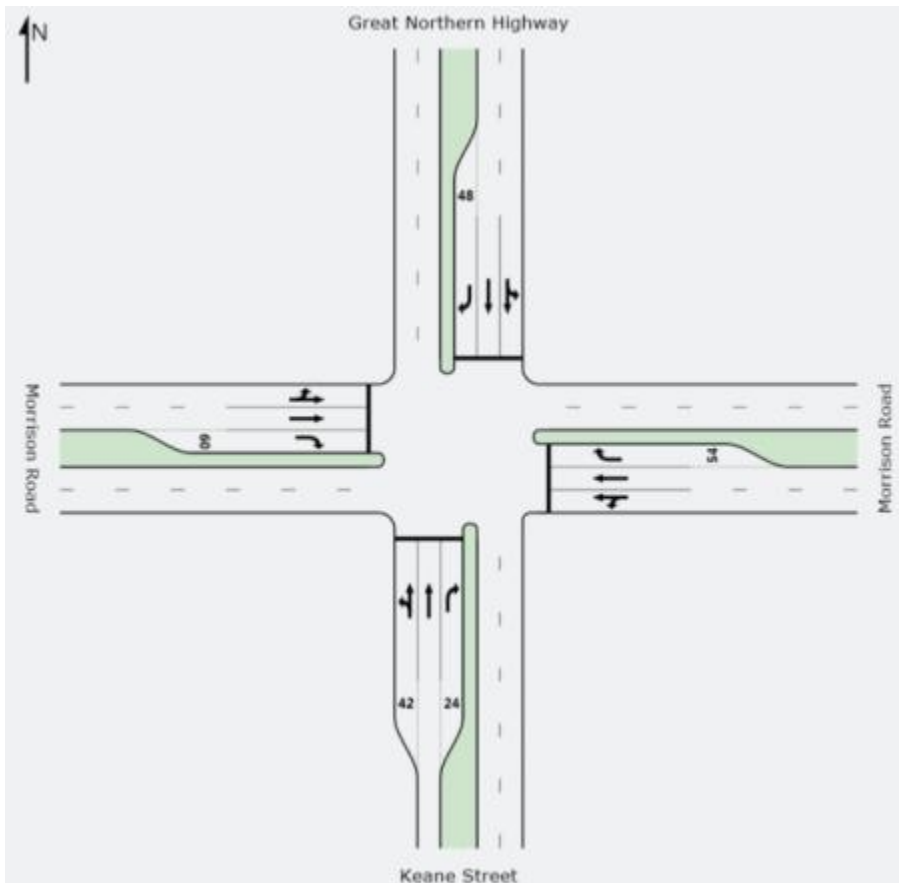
Morrison Road / Keane Street / Great Northern Highway – Existing Geometry
